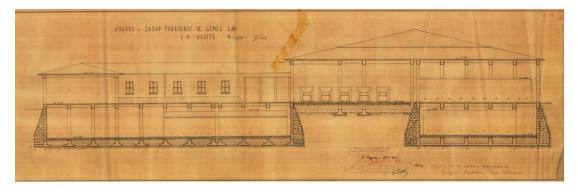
The original drawing of the wine and whiskey production building, the C-D section, scale 1/100, Construction Section in General Directorate of TEKEL, 17.03.1947 (Source: TTA Archive)
